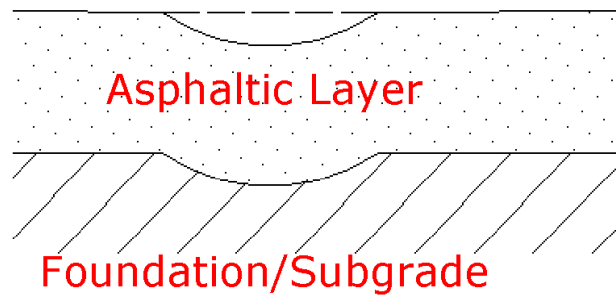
1 Typical pavement cross sections (after Highways Agency, 2003)
